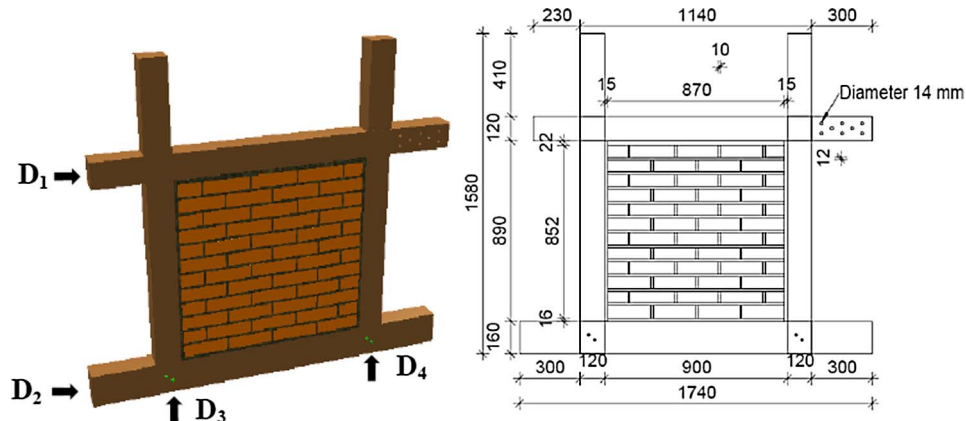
TFM-CH specimen layout (left) and dimensions (right) [9].
